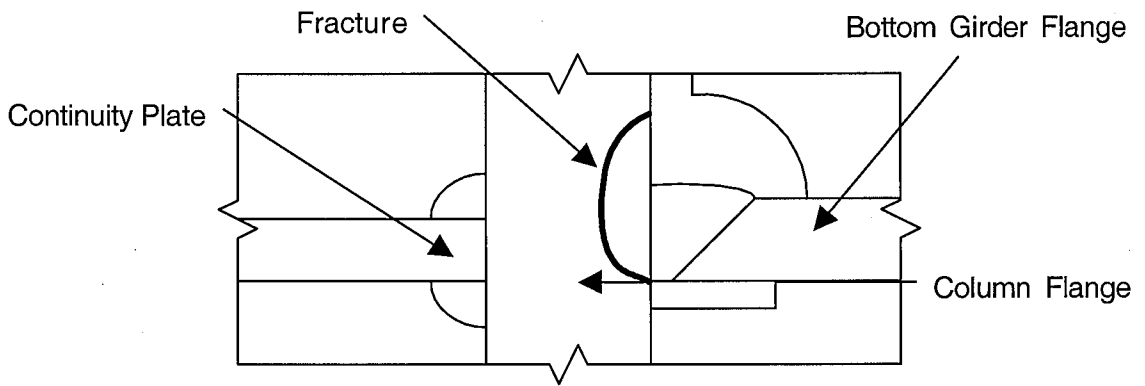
Damage Type C2 (Girder Flange Pull-Out From Column Flange)
